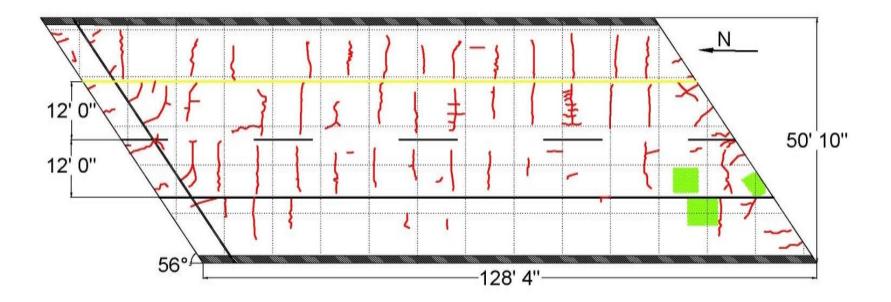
Distress map for Dannon Way southbound conventional concrete deck at 1 year.
